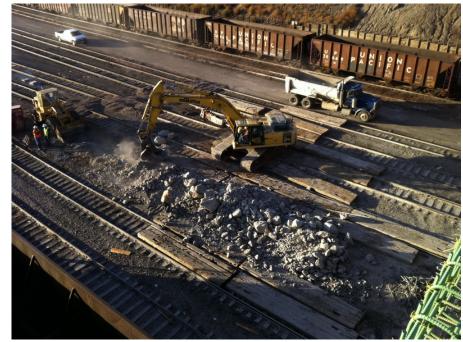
Abutment 1 EB Construction – October 21, 2010:
